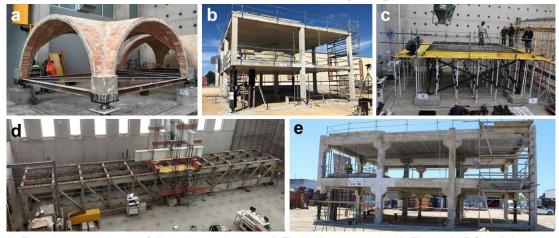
Experimental tests on full-scale specimens: a) Timbrel cross-vault; b) Flat slab RC building structure; c) Shoring of a RC building structure; d) Steel riveted railway bridge; e) Precast building structure
